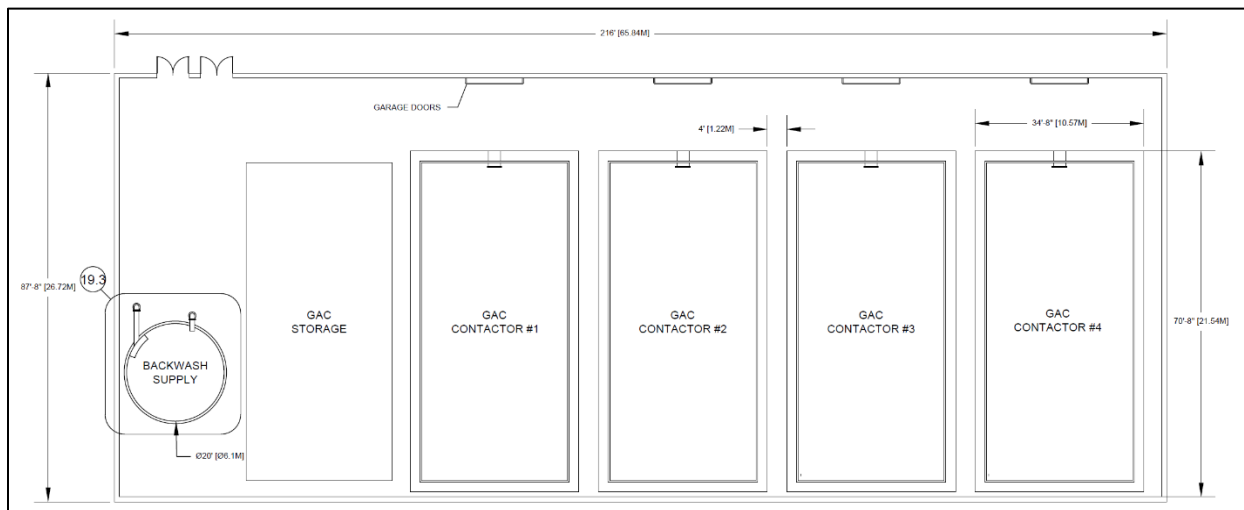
GAC Facility Layout From Forefront Consulting drawing set page 15, Appendix 9.6
